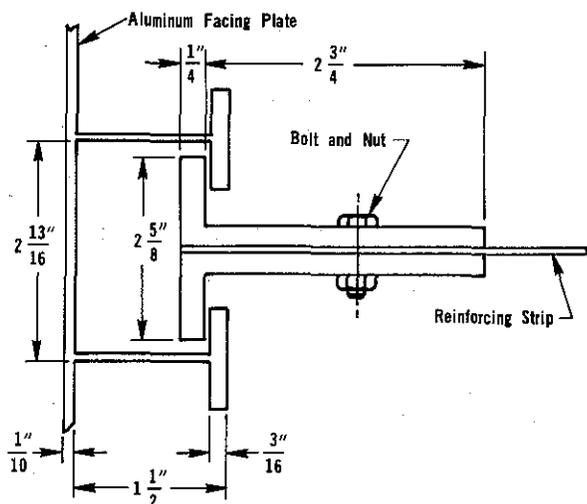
Detail of Reinforcement Facing Plate Connection - WES Wall
